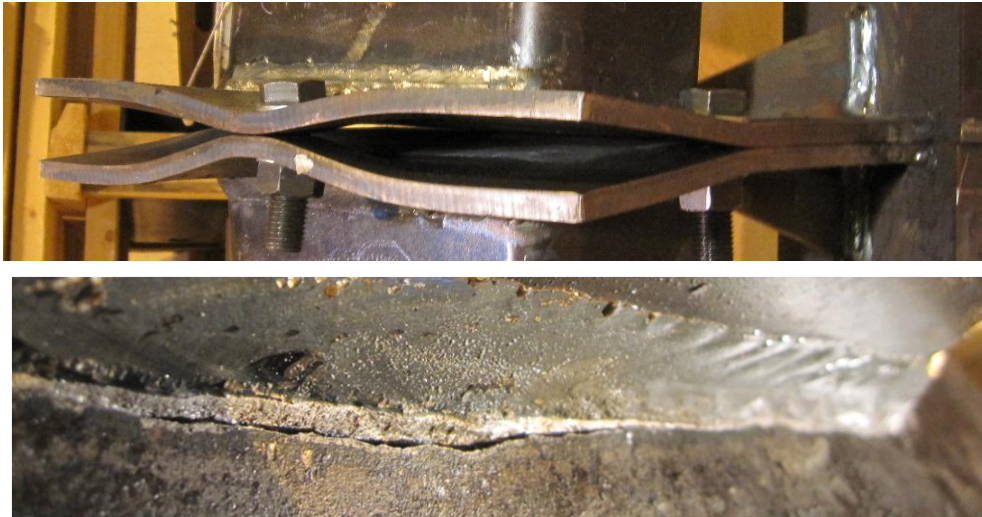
Deformed splice with the mid-side bolts (above) and crack in the lower longer side near the weld toe (below) after tests TE11.
